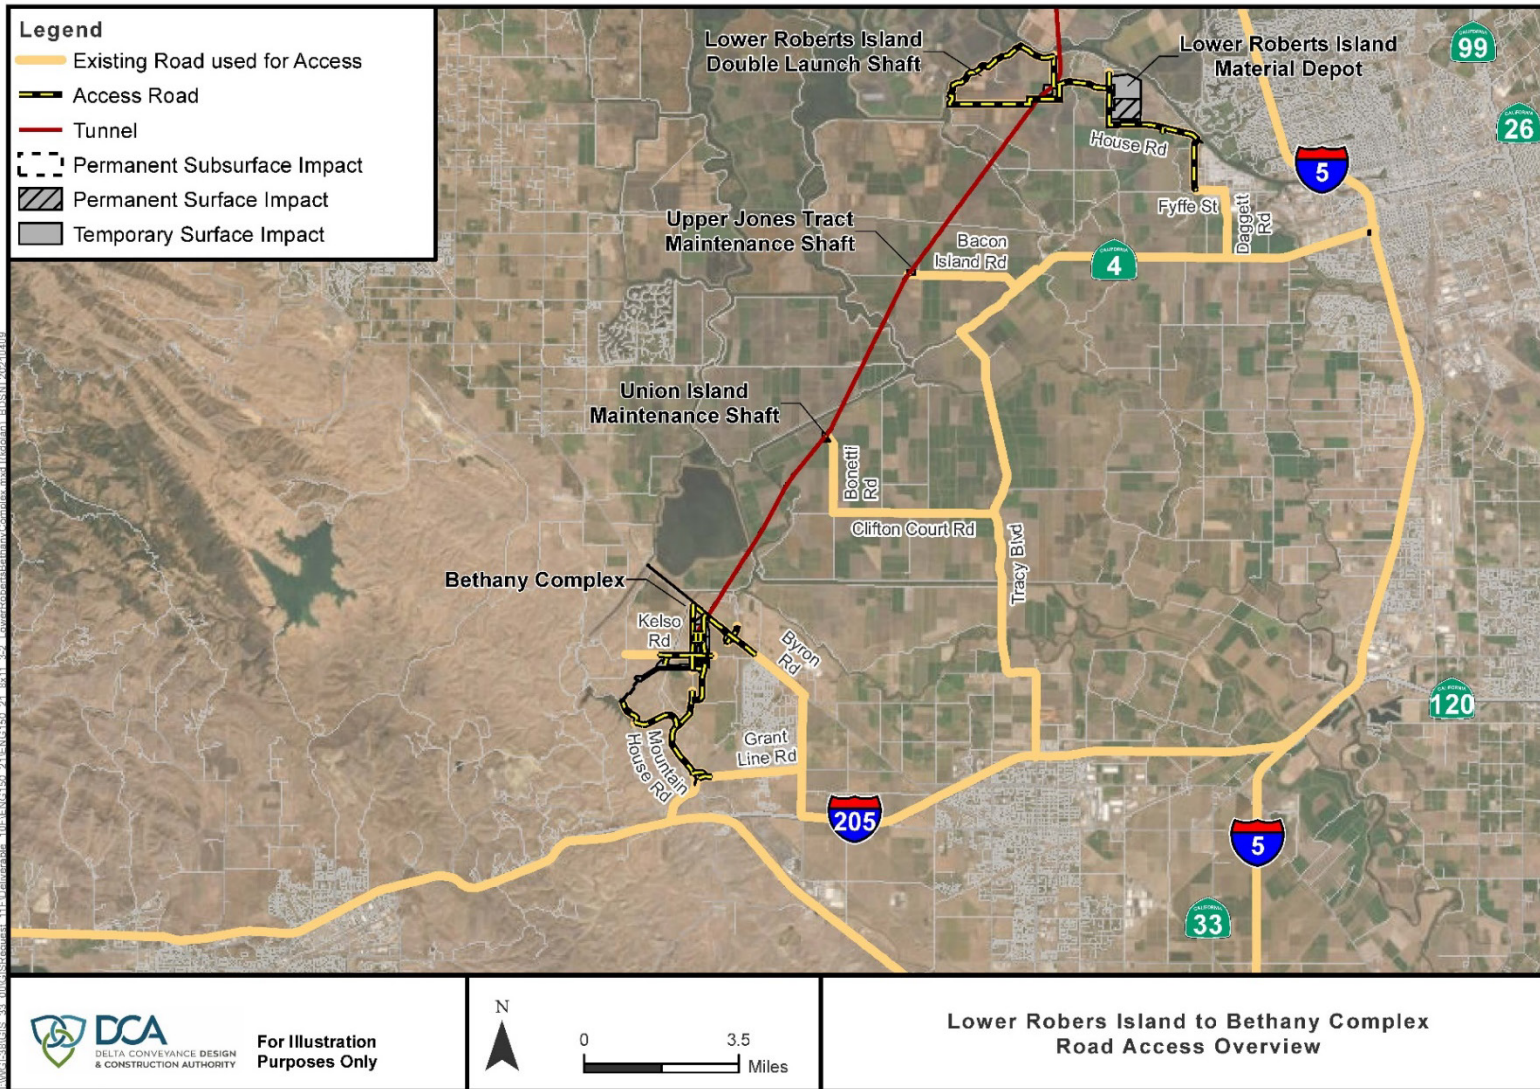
Lower Roberts Island to Bethany Complex Road Access
